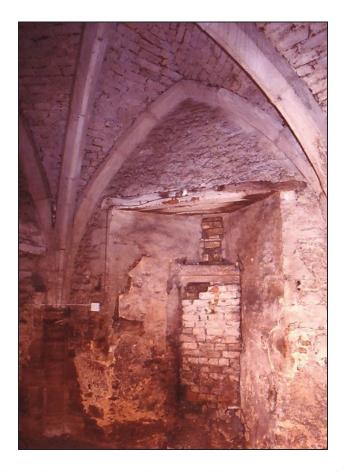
Medieval window opening in the east wall of Room G13, subsequently converted into a doorway.
